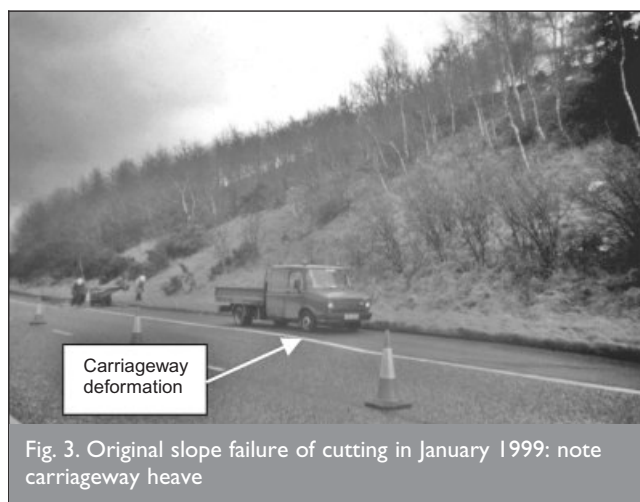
Original slope failure of cutting in January 1999: note carriageway heave
